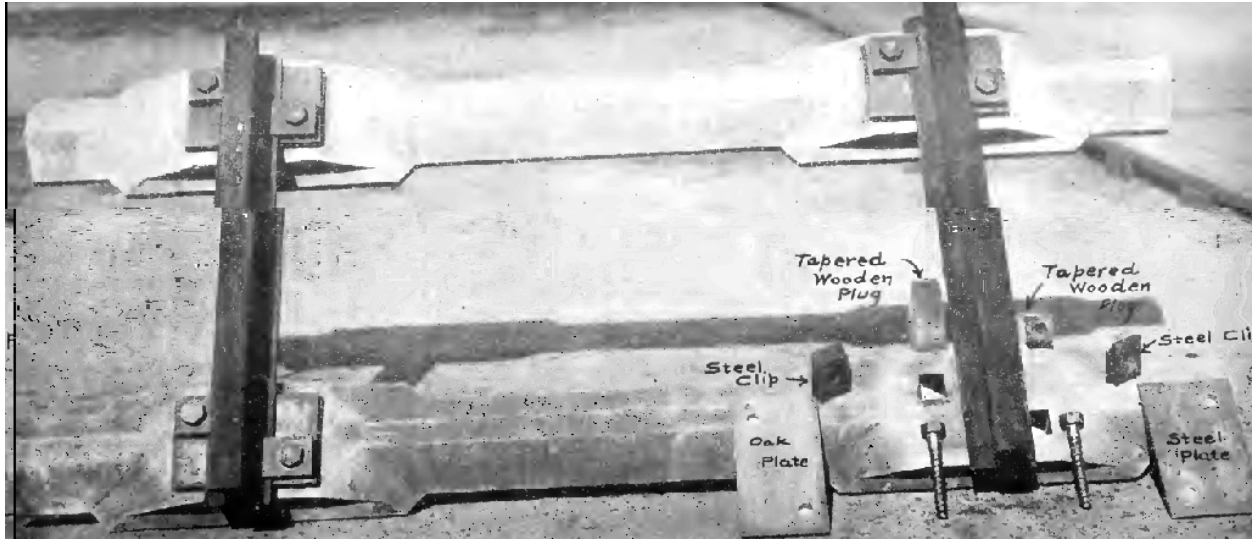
Reinforced concrete tie with steel and wood plates at the rail seat, installed on the Pittsburgh & Lake Erie Railroad (AREA 1912)
